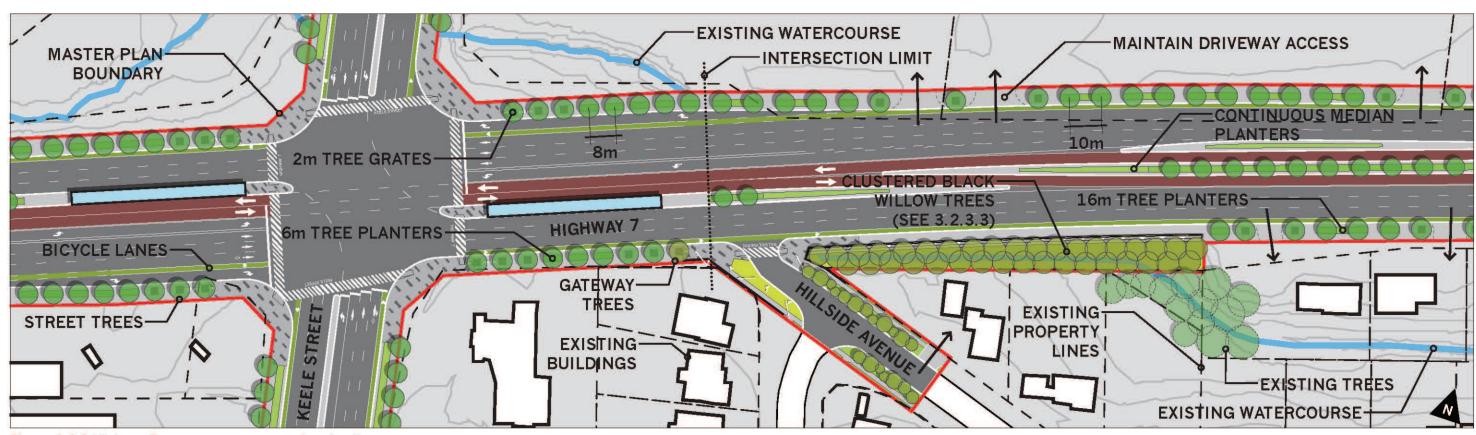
Highway 7 streetscape concept plan detail.
